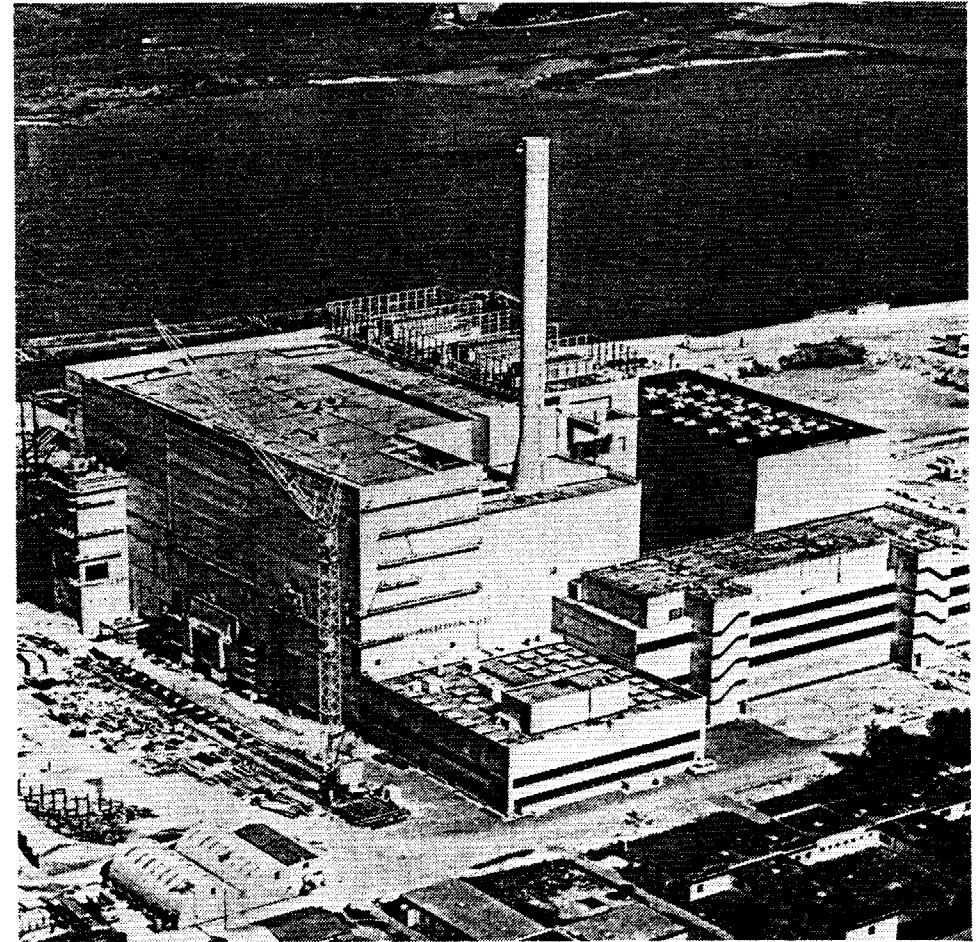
Aerial View of SNR 300 Plant Site (August 1978)
